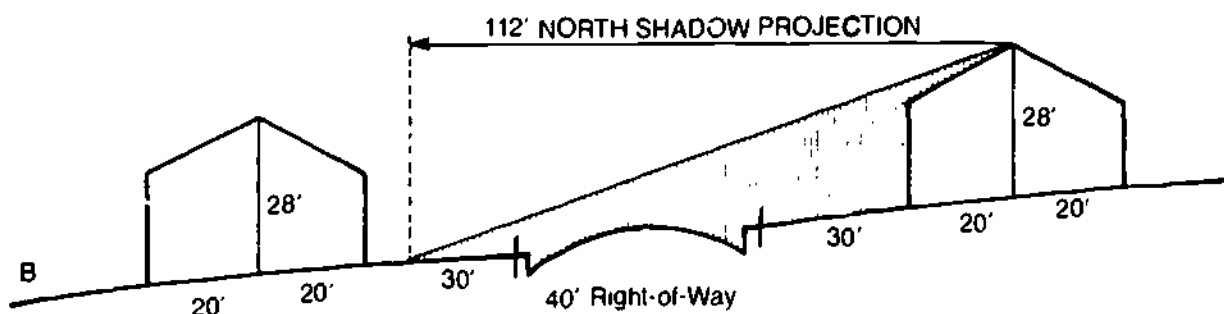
South-Wall Access Protected by a 28-Foot Tall Building
